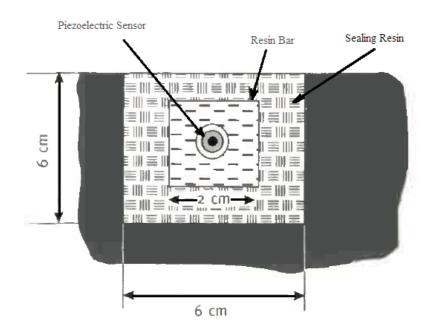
Cross section of a piezoelectric sensor installed on the road
